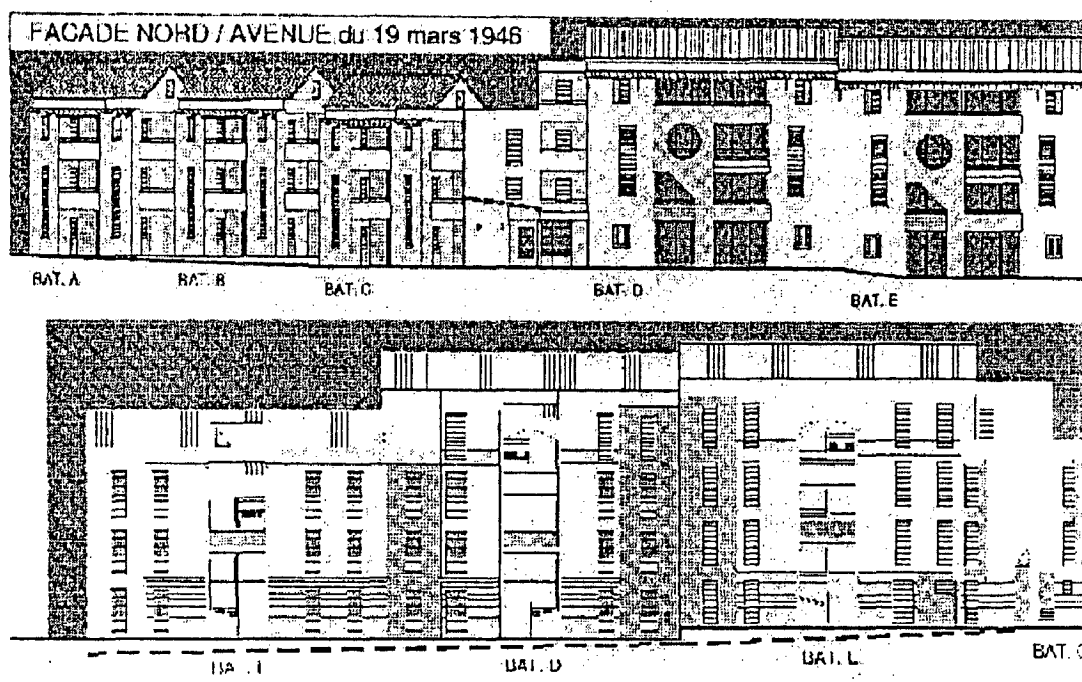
Detailed project stage of north-east (upper) and south west (lower) facades. The architect can colour the facades provided they have good solar protection.
